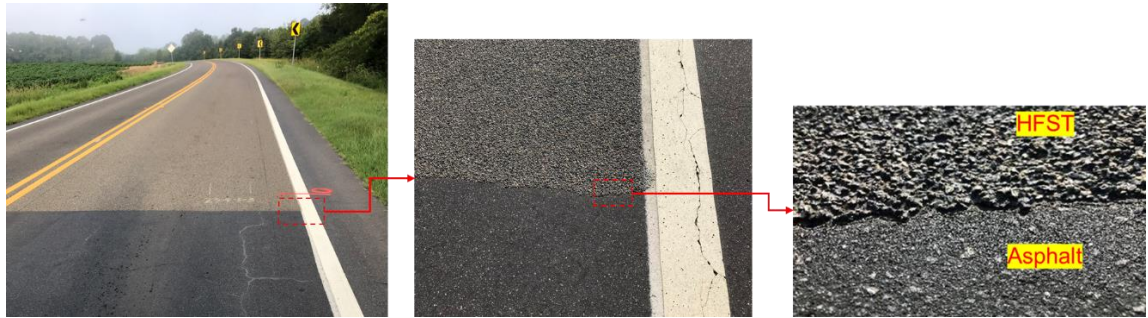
Pictures. An example of HFST installed on a curved roadway and a close view of HFST over an asphalt pavement surface.
